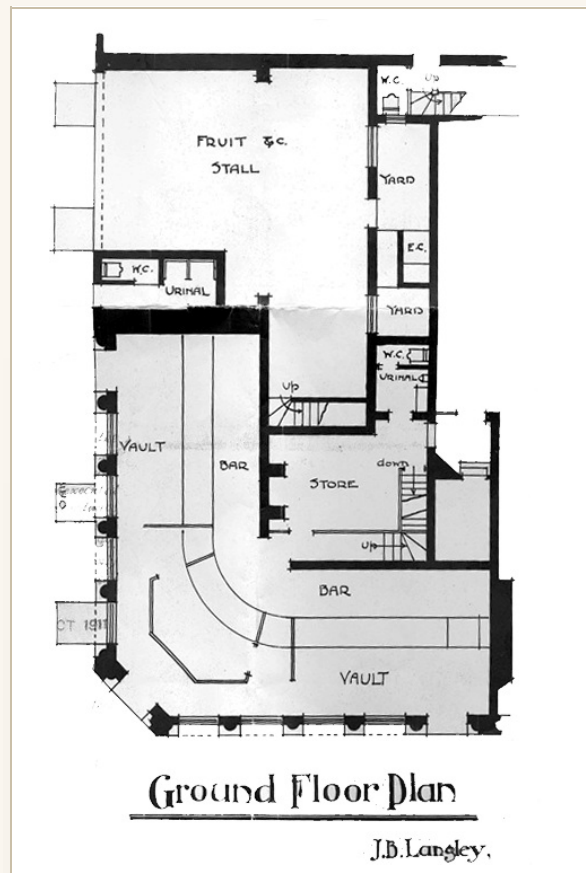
1911 architectural drawing, The George & Dragon, existing ground floor
